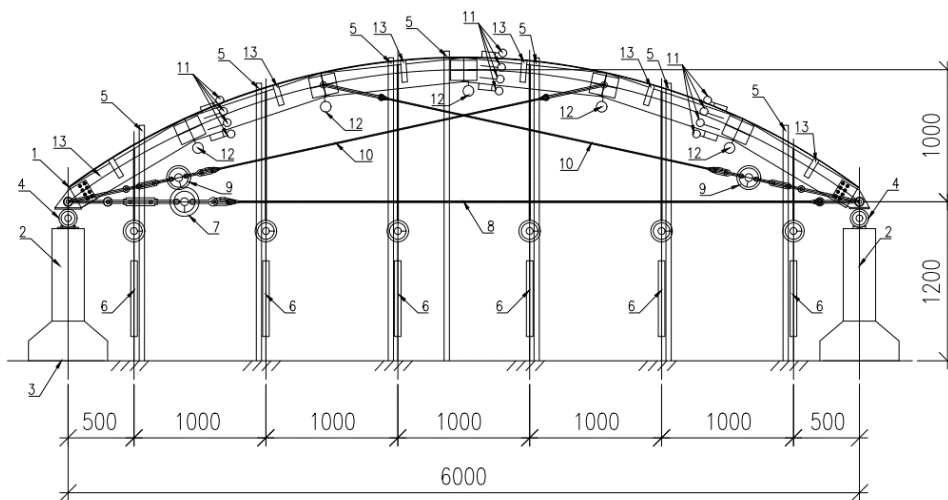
The scheme of the test stand with the layout of devices 1 - arch made up of board segments connected by clamping plates (1); 2 - abutment, fixed to reinforced floor; 4 - dynamometers on abutment D1 and D2; 5 - system of struts to ensure the stability of the arch; 6 - hydraulic jacks with a dynamometer of D3 ... D8; 7 - dynamometer D9; 8 - horizontal tie bar; 9 - dynamometers D10, D11; 10 - angular tie bars; 11 - micro dial gauge Mi1 ... Mi18 for rectangular cross-section, micro dial gauge Mi1 ... Mi-24 for the T-section; 12 - Aistov's deflectometer 6ПАО П1...П5; 13 - angle stiffeners of T-section arches
